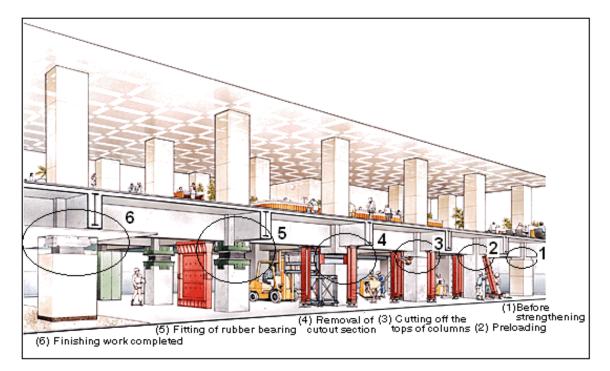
Retrofitting on the 1st Floor, 2nd Floor and above is business as usual)
